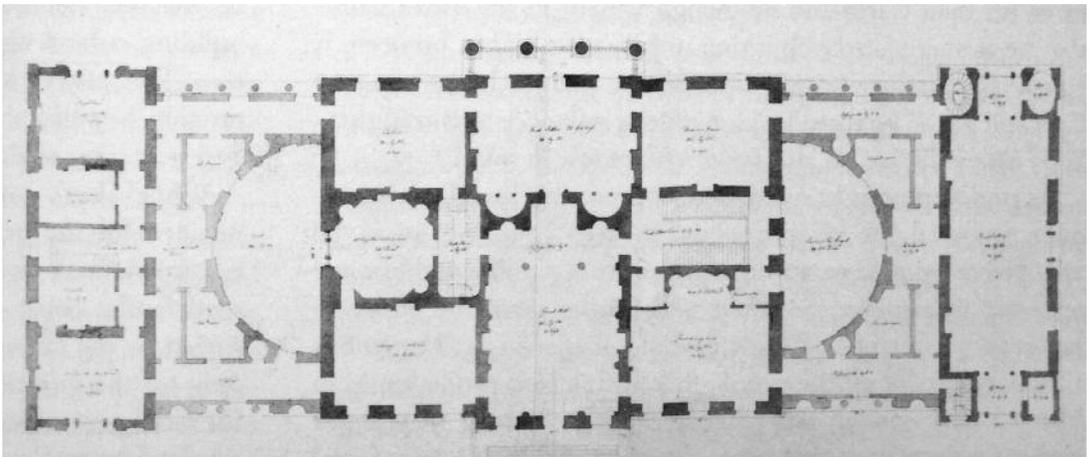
Harewood House, plan by Robert Adam, 1758. (Sir John Soane's Museum)
